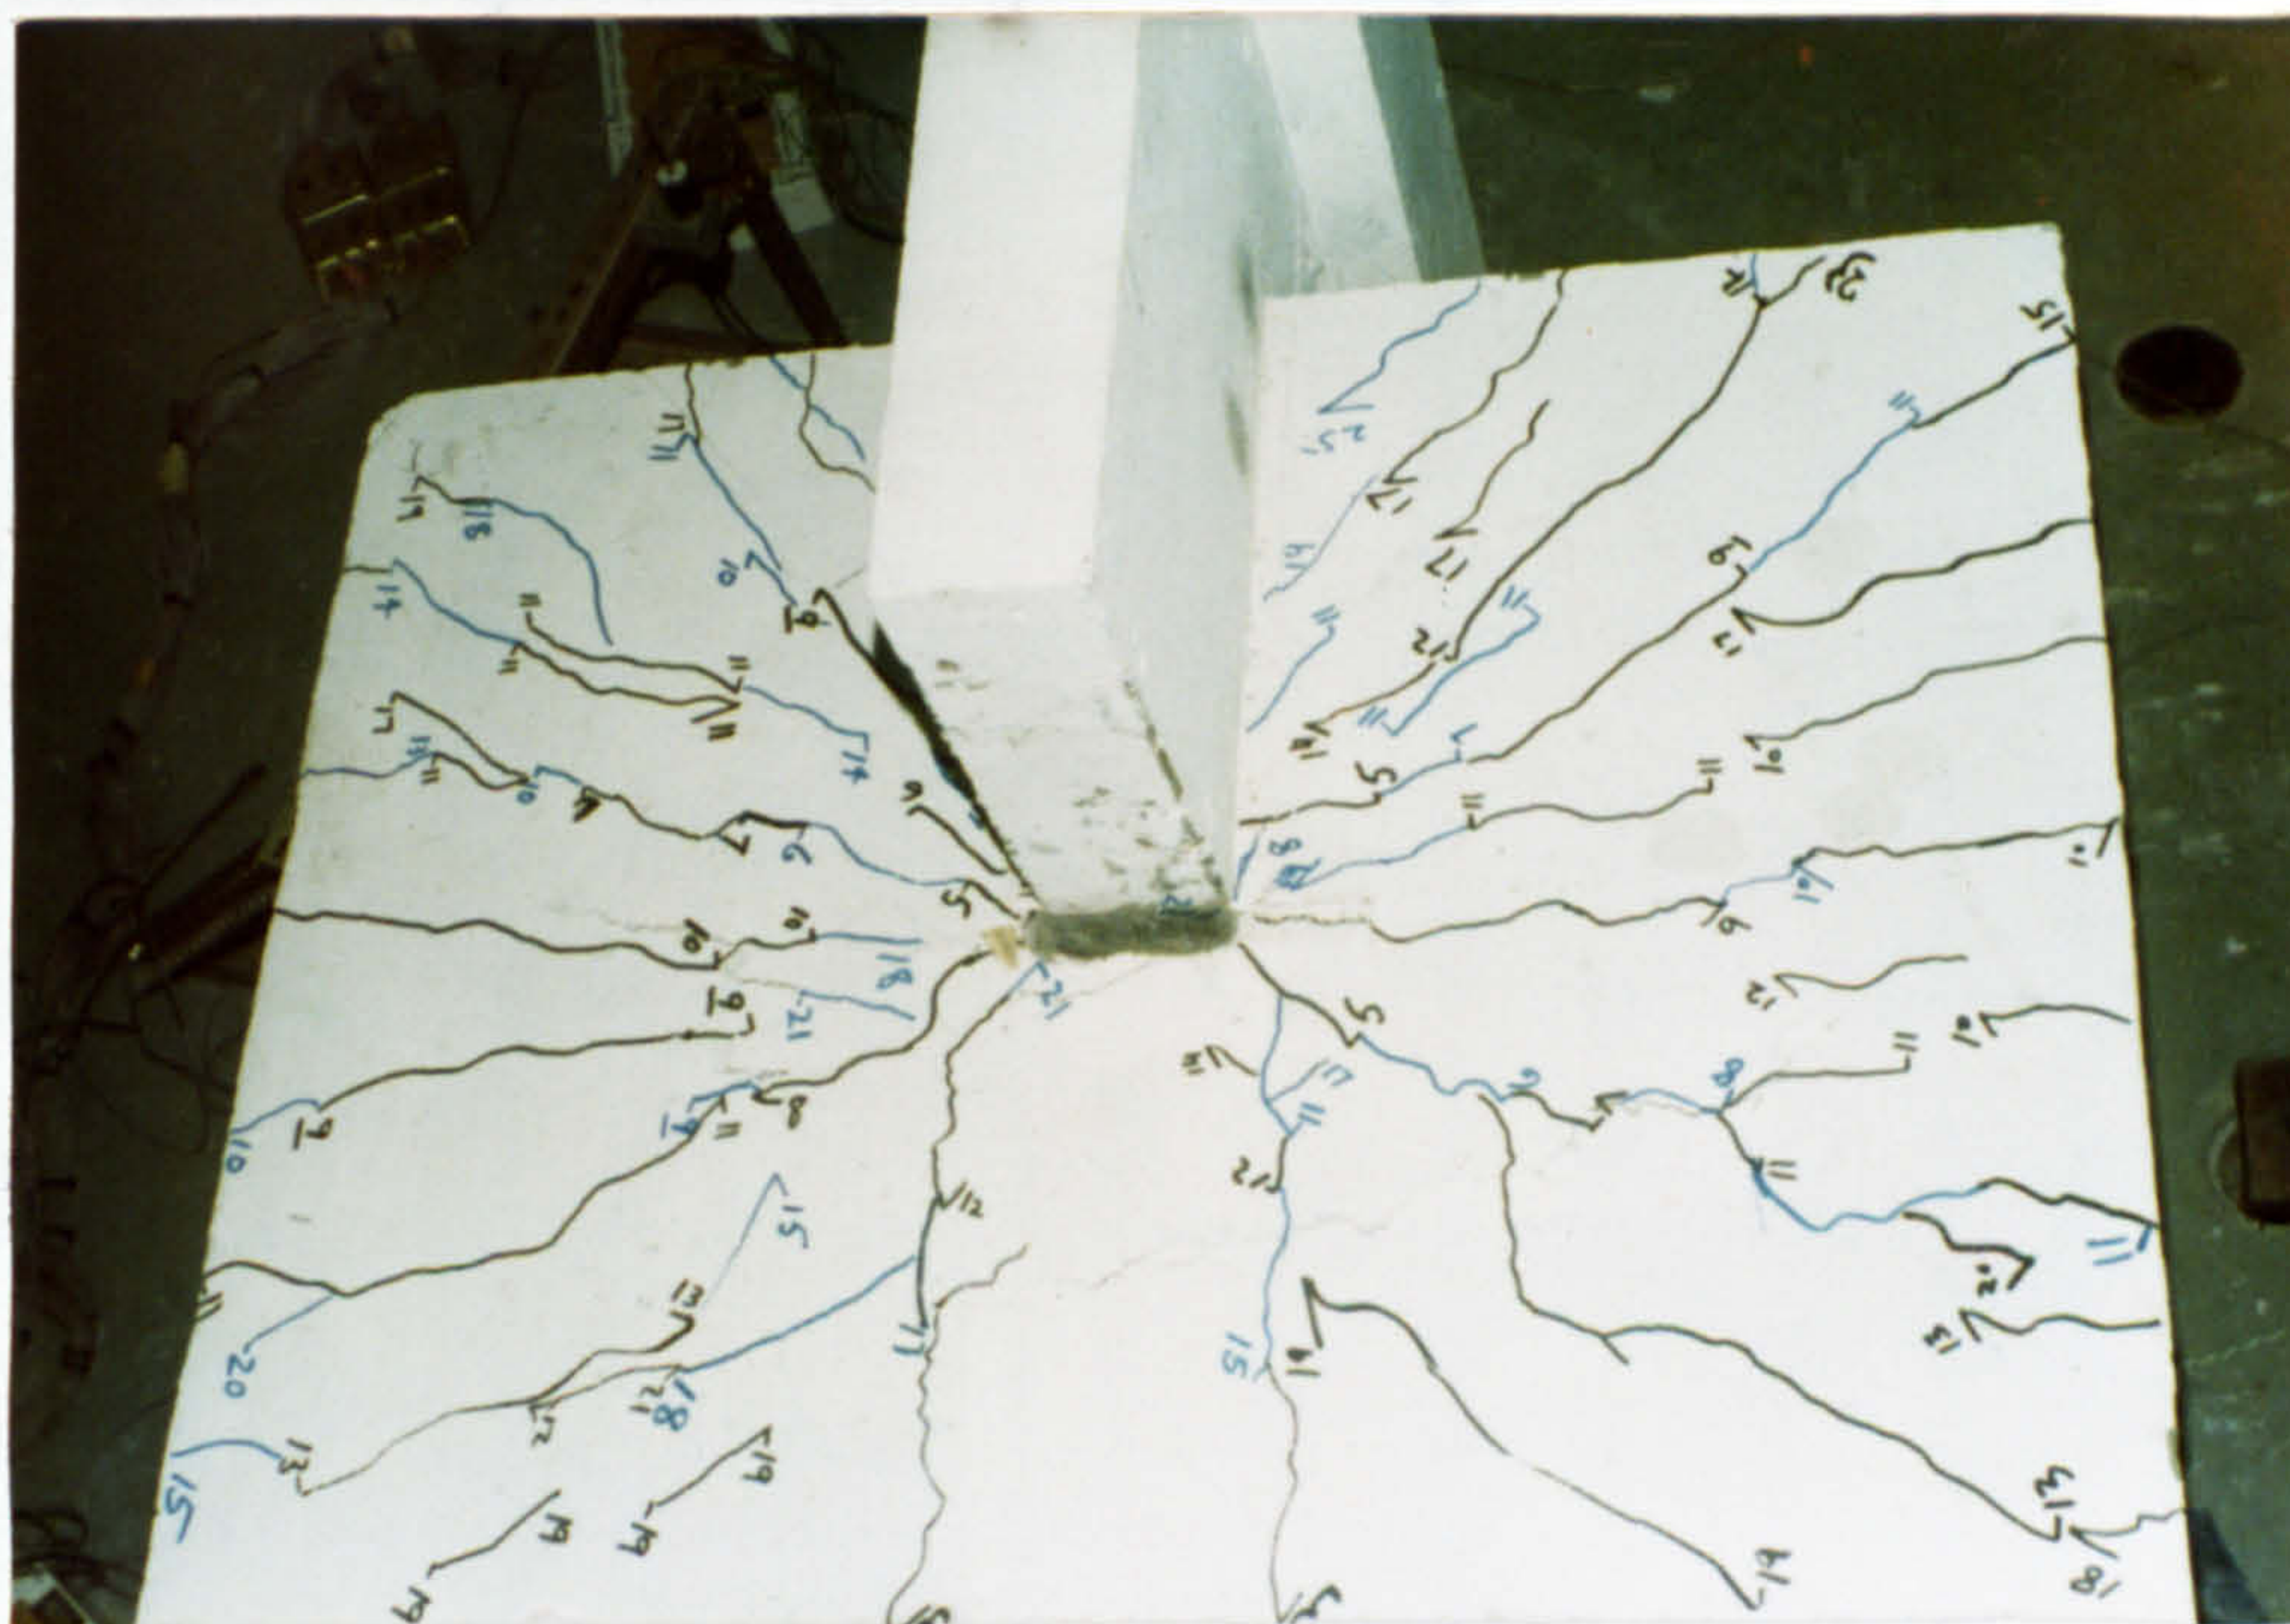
Crack pattern of the slab of PT3 after failure.
